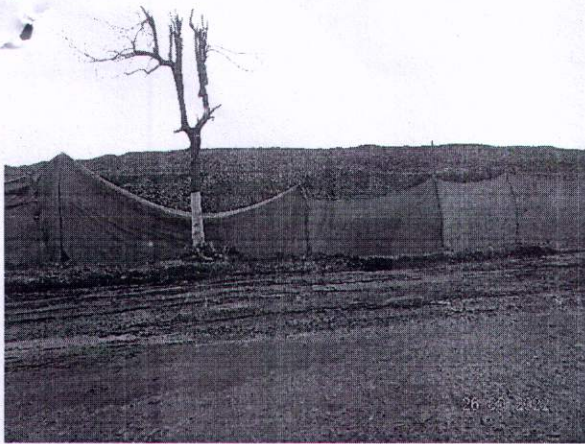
Photo of fabric sheets used in place of broken wall in the north east direction of projectthe
